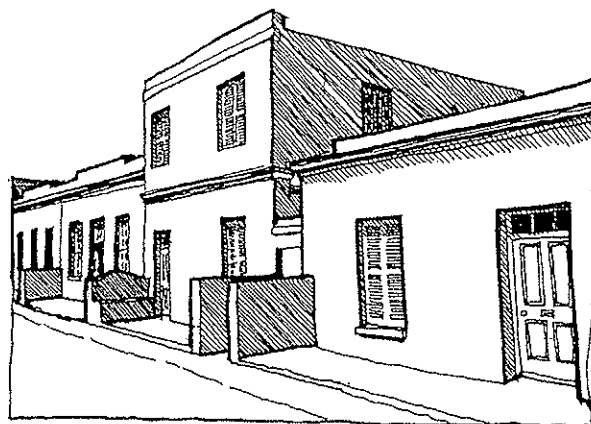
A double storey addition over the whole house has a significant effect on the streetscape and the facade of the house.
